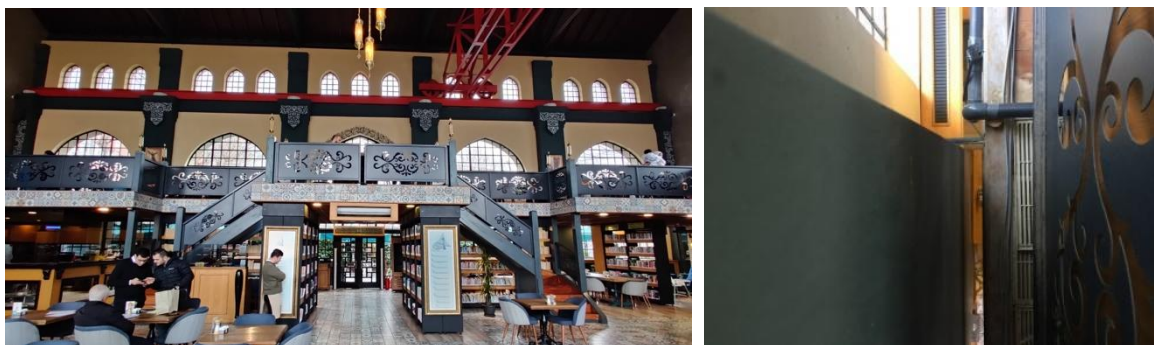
Mezzanine floor and masonry structural wall (Torunbalcı archive, 2019)
